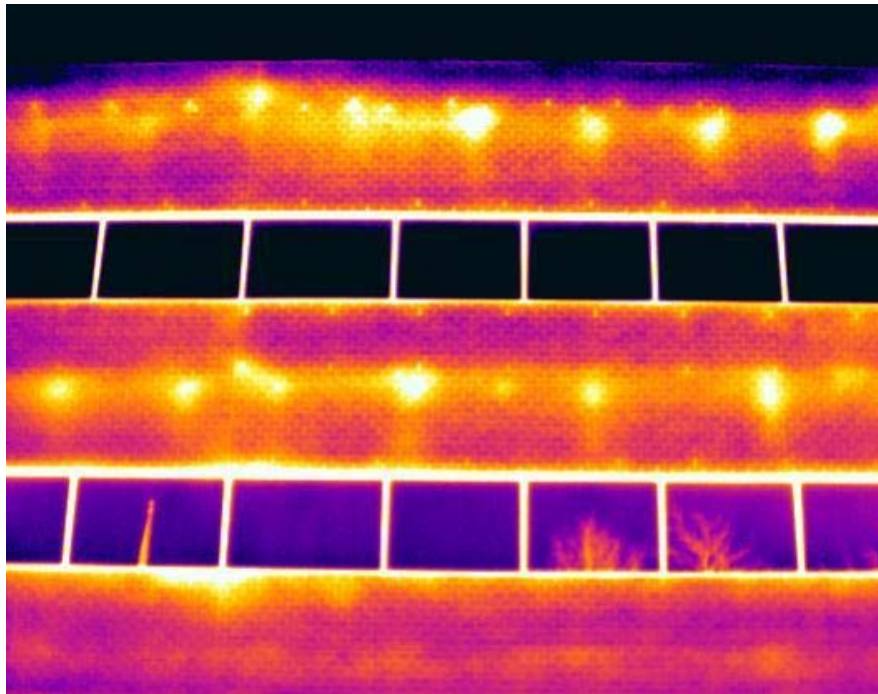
Infrared image for thermal bridging in spandrel beams
